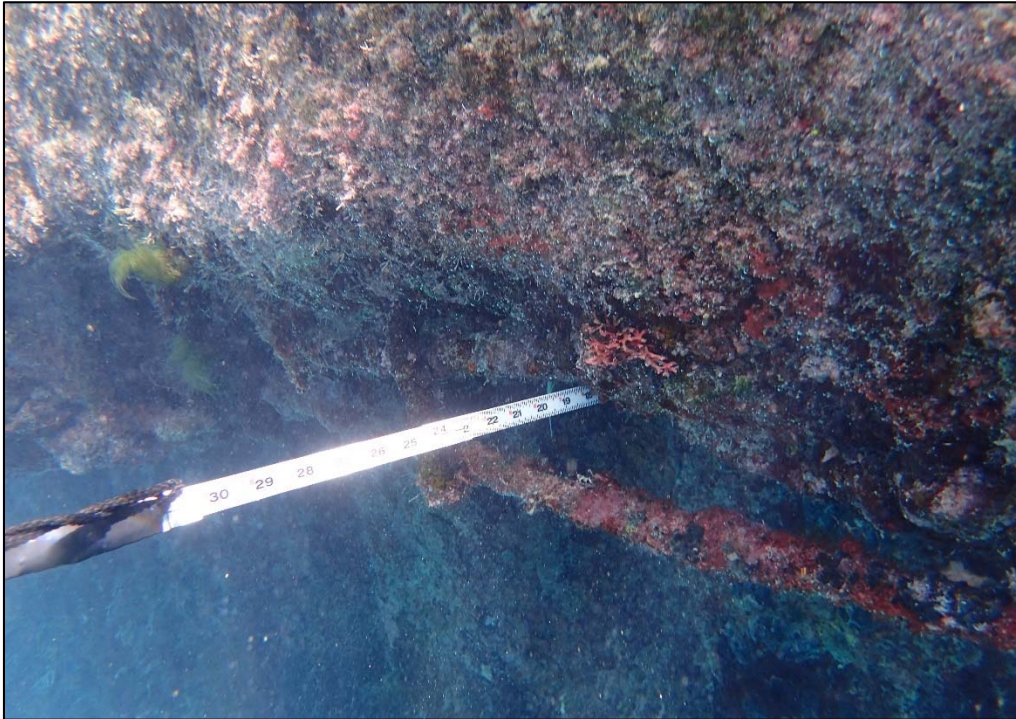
Berth 1 concrete cap. Poorly placed and poorly consolidated concrete at Station 0+96 exposes three longitudinal bars, with up to 100% section loss, and six vertical bars. The section of concrete loss is 4-ft long, 2-ft deep and 1-ft high. See Attachment B for further discussion of concrete deterioration.
